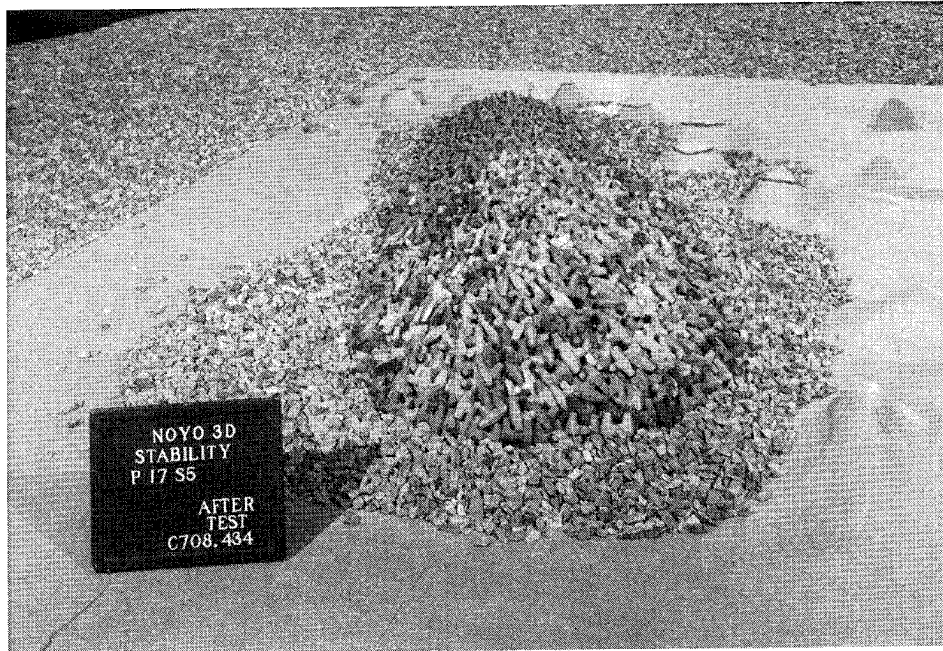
Plan 17, north roundhead after five series of modified Storm IB waves
